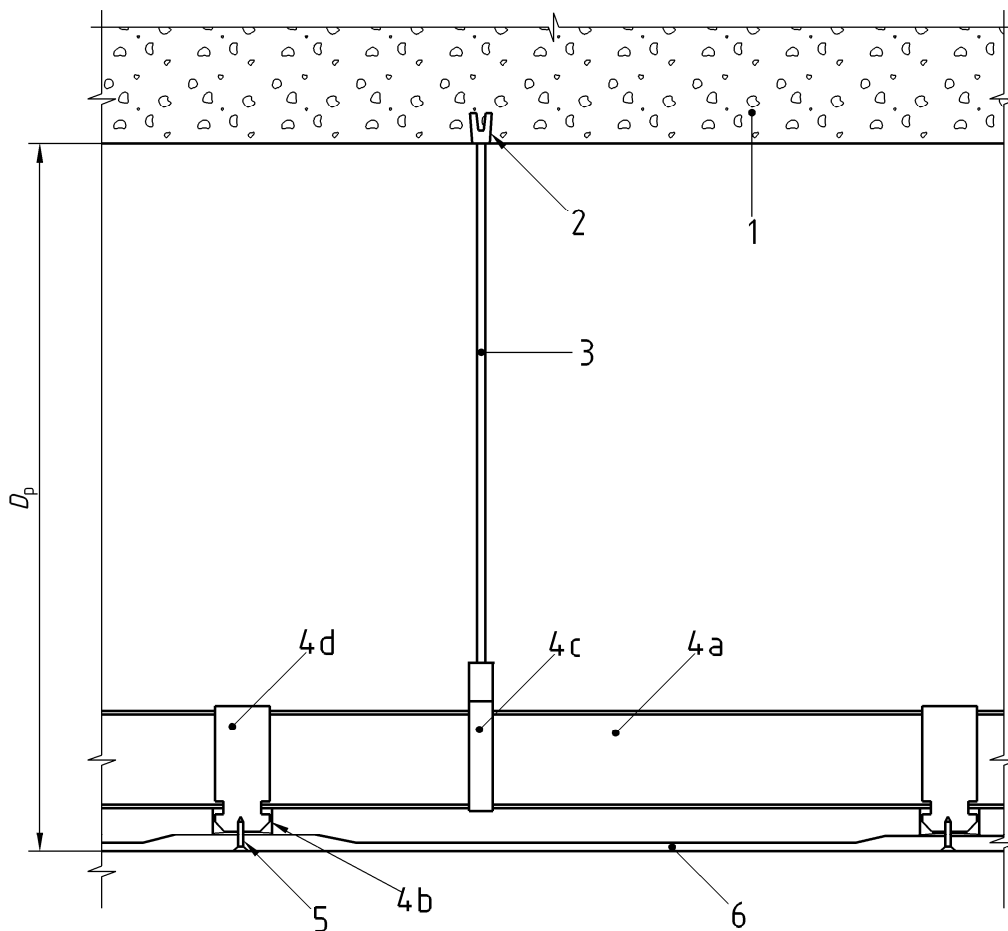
a) — Example of diagrams for the installation of fibrous plaster suspended ceilings (sealed system)
